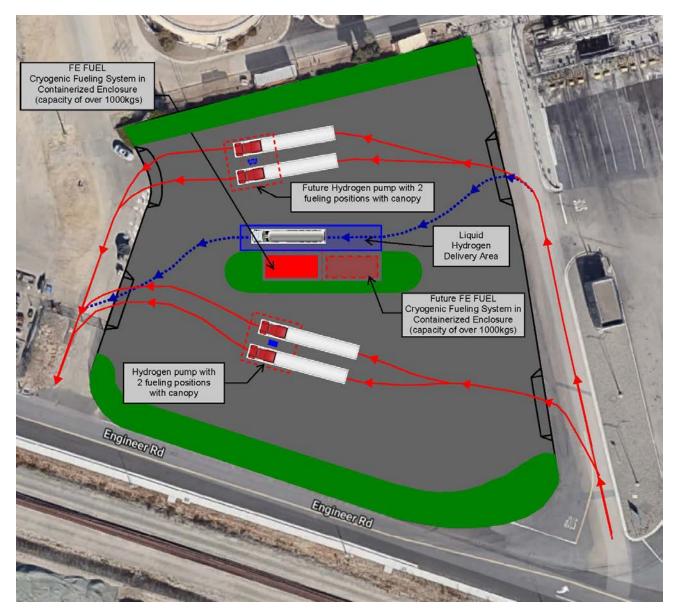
Proposed Hydrogen Refueling Station Site Layout
